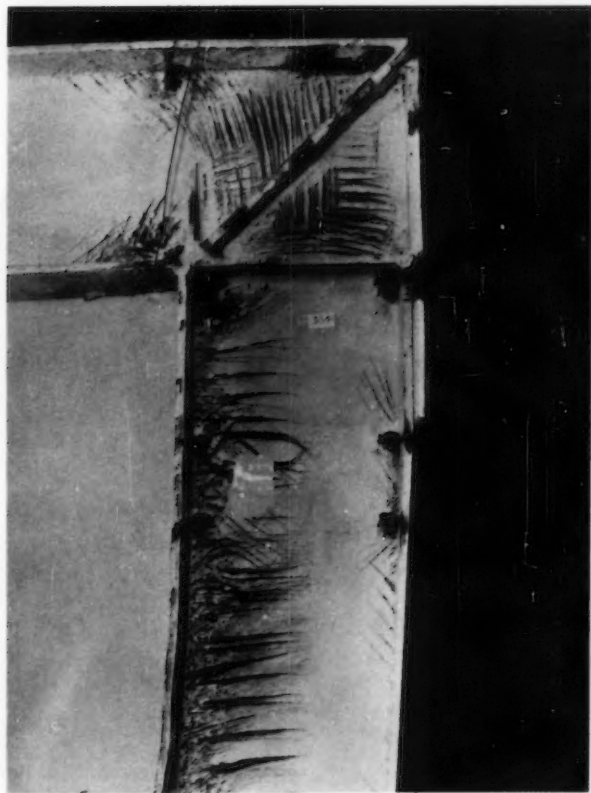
Typical Behavior of Corner Connection Joining 12WF36 Shapes.
